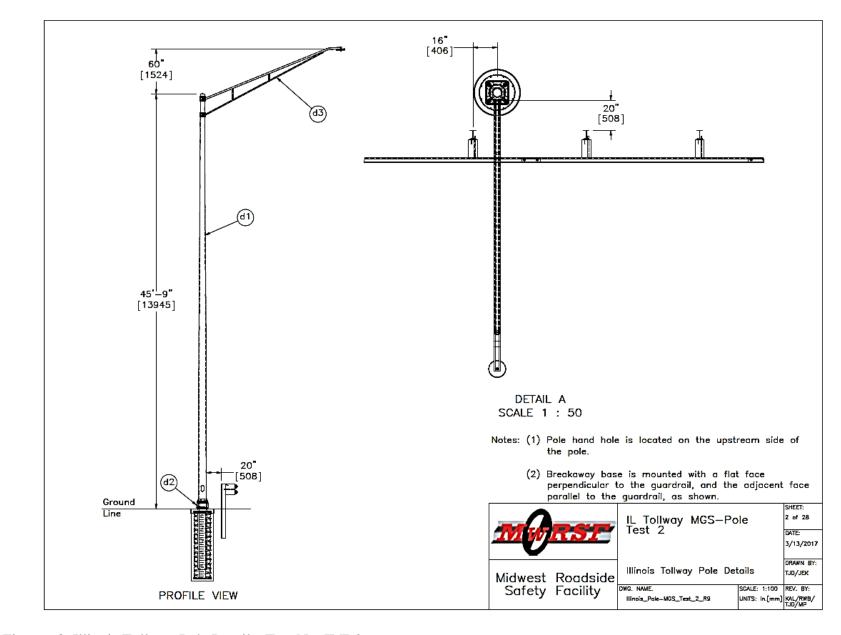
Illinois Tollway Pole Details, Test No. ILT-2
